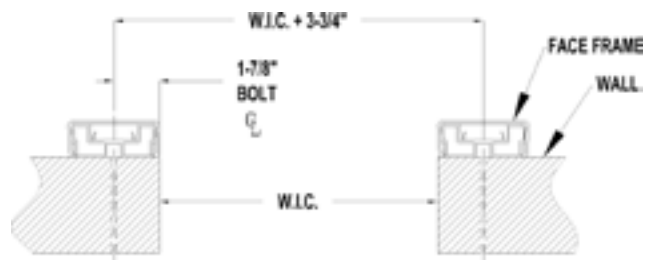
Wall Clip Position - Frames with no Jamb or Inside Trim
